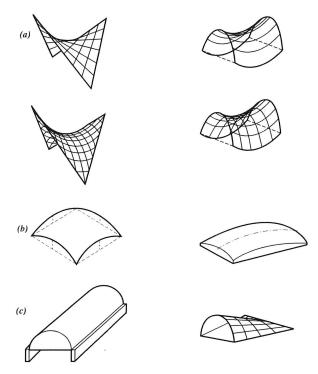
Range of shell types commonly used in timber construction. (a) Hyperbolic paraboloids, (b) elliptical paraboloids, (c) long barrel vault (left) and conoid (right).
